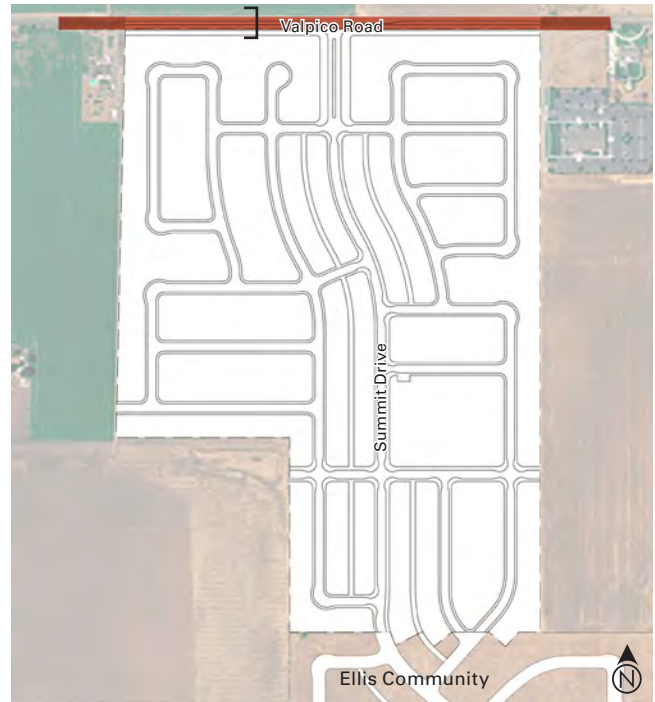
Key Plan: Regional Arterial – Valpico Road, Designation A (Final Build-out)
